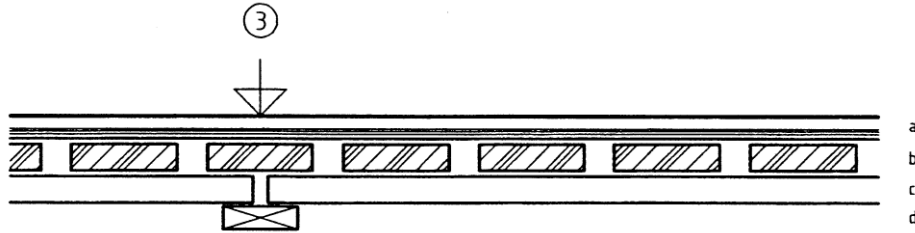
Surface-elastic floors with elastic construction (with one sprung beams layer and staggered supports)
